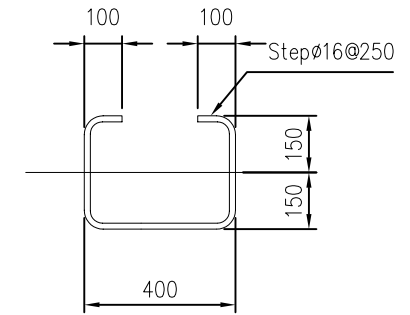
DETAIL OF HEAD CAP OF STEEL SHEET PILE
